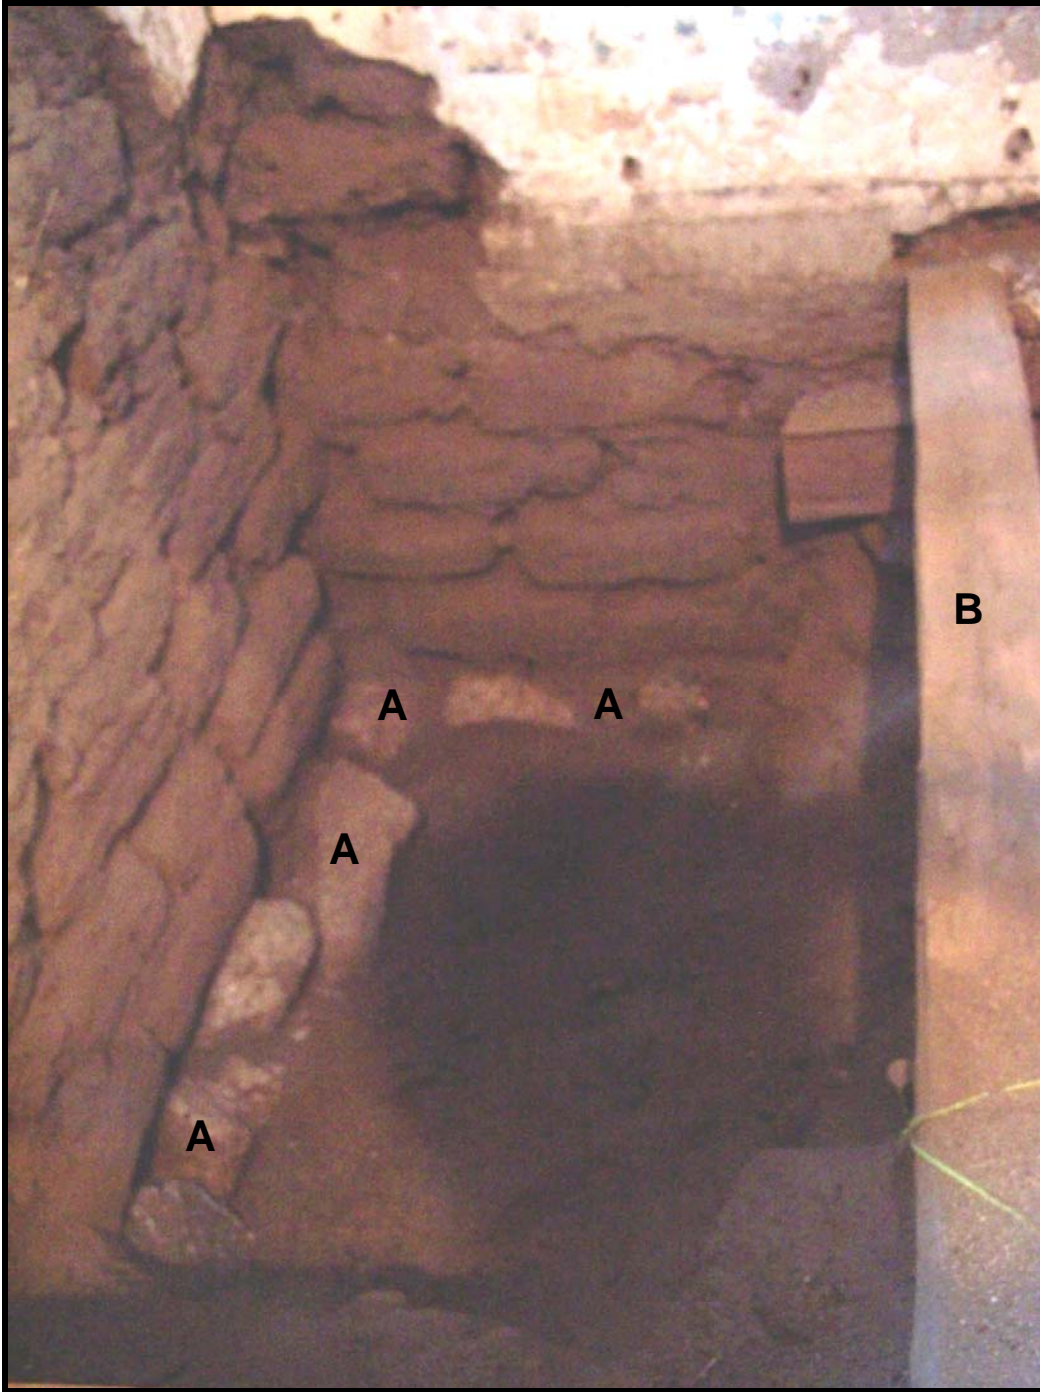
Angular granite field stone foundation (A) in Unit 10-6 at the northwest corner of Room 105. The wooden floor sleeper is in the upper right (B). At this point the foundation is around 14 inches lower than in the rest of the Central Wing.
